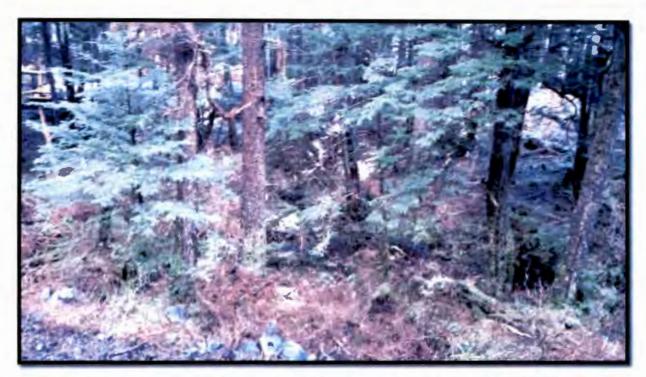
Looking downslope from access road at outlet of newly installed 18" CPP. The foot of the toe slope is the start of a defined stream channel for this drainage on Lot #211.
